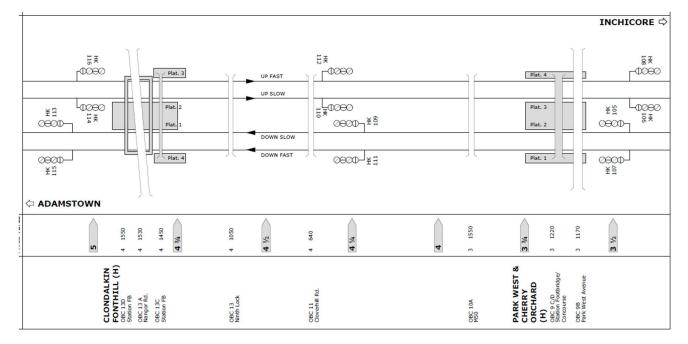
Existing track layout (Extracted from Route Information Book 1)
